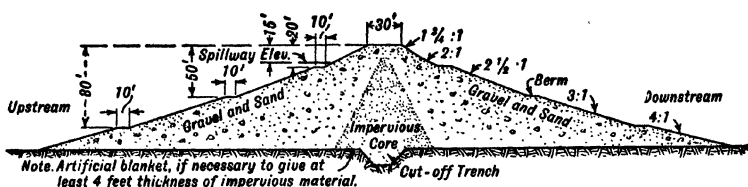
Typical Section of Earth Dams of Miami Conservancy District, built by Hydraulic Fill Method of Construction.\
